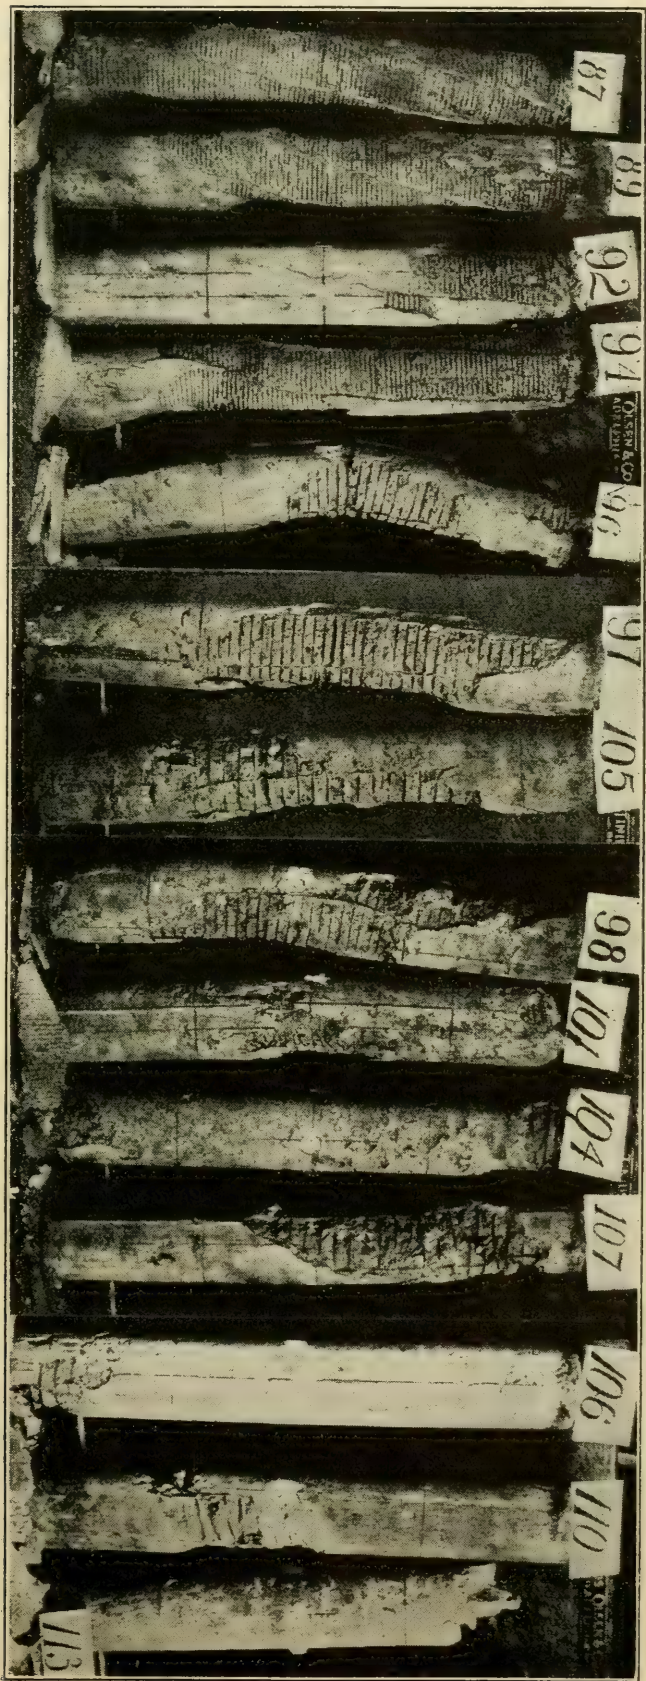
APPEARANCE OF CERTAIN TYPICAL COLUMNS AFTER TEST.
